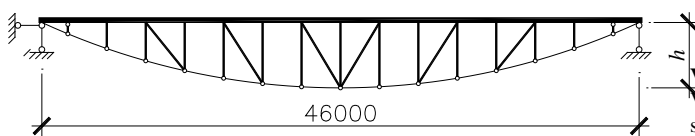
Rational structure of trussed beam. (Spatial bracings conditionally are not shown in Fig.8)
